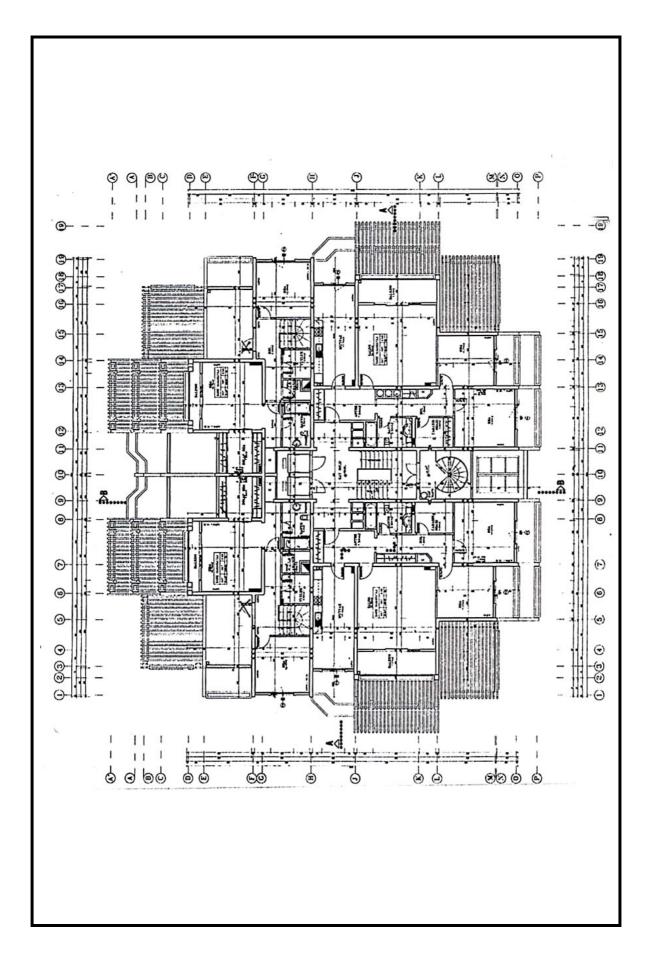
Mavişehir II; Flamingo 21st Floor Plan
